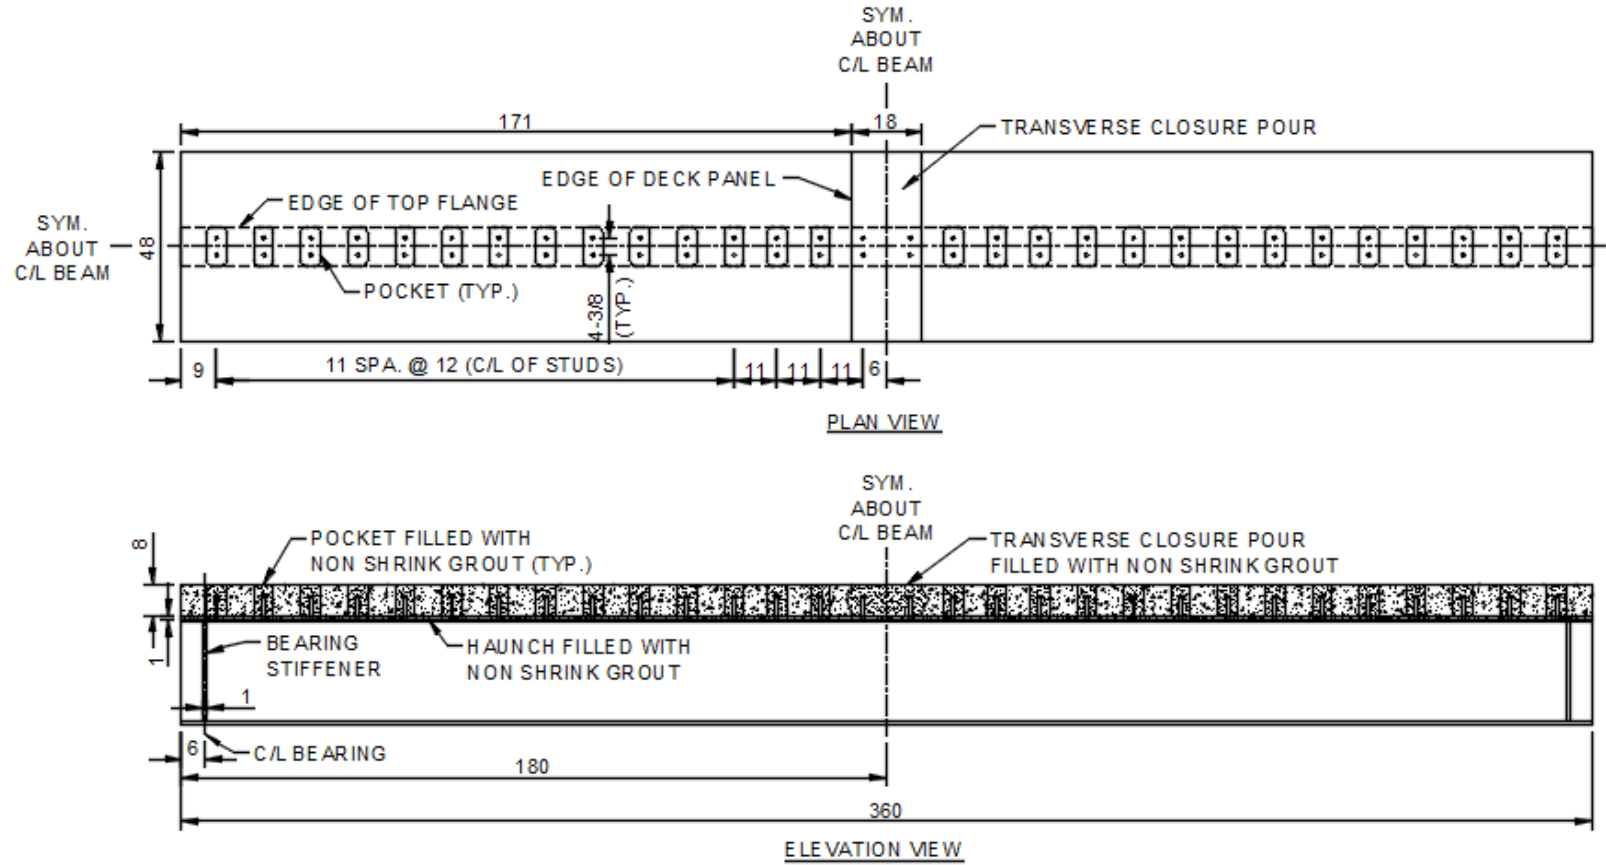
through figure 12 show plan and elevation views for each of the large-scale beams tested in this study. Typical sections for each of the beams, except for beam 2S1, are also shown in figure 12. Beam 2S1 has the same sections, except rather than a single shear stud across the width of the flange, there are two shear studs spaced at $4\frac{3}{8}$ inches apart, symmetrically located about the center of the beam web, as shown in figure 8.
